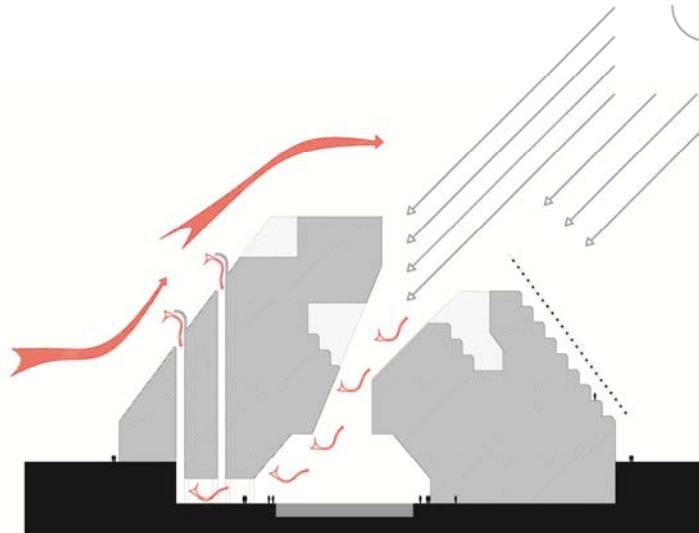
Site Section, Applicability of a dome shape structure into a modern apartment building typology. Source: Author
